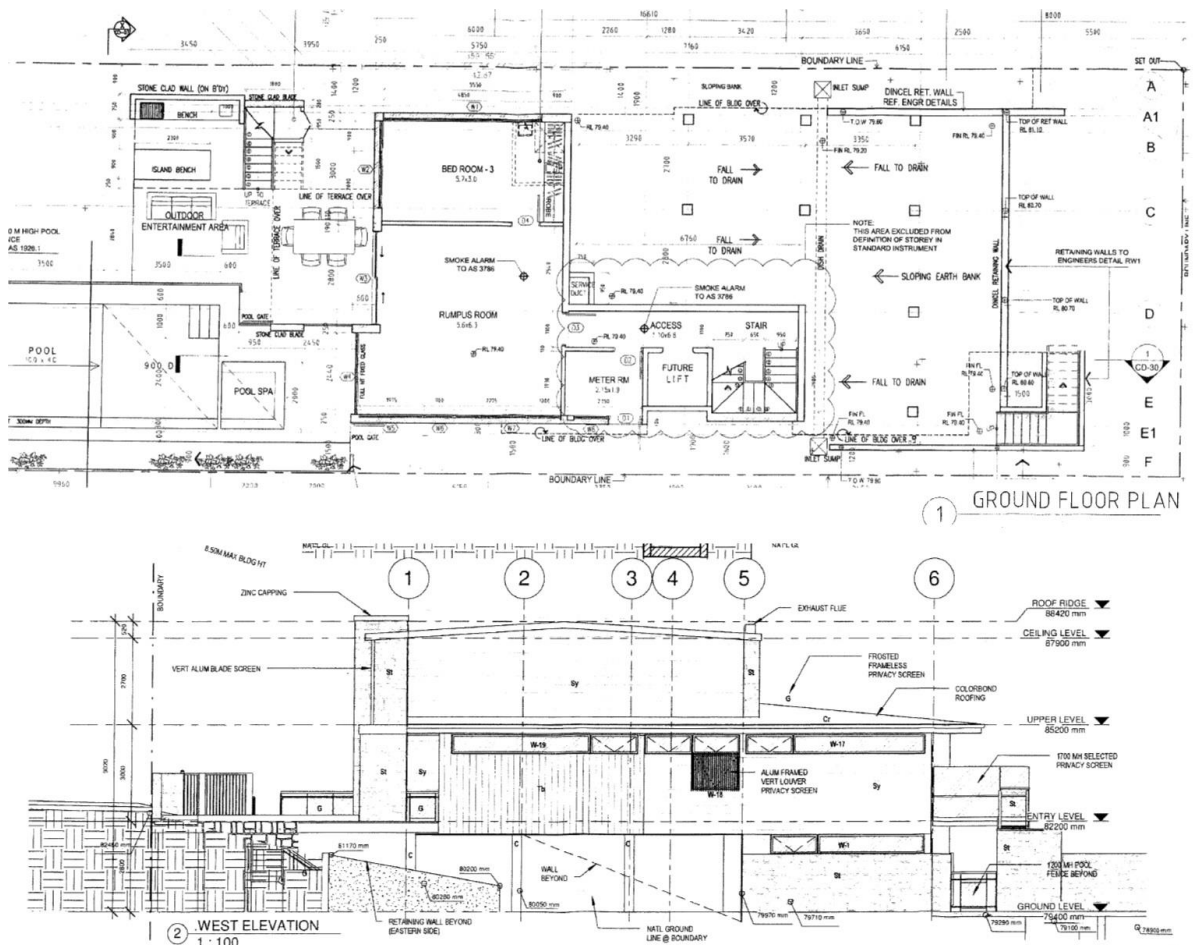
Approved Complying Development Certificate Ground Floor Plan (Lower Ground Floor) and West Elevation
